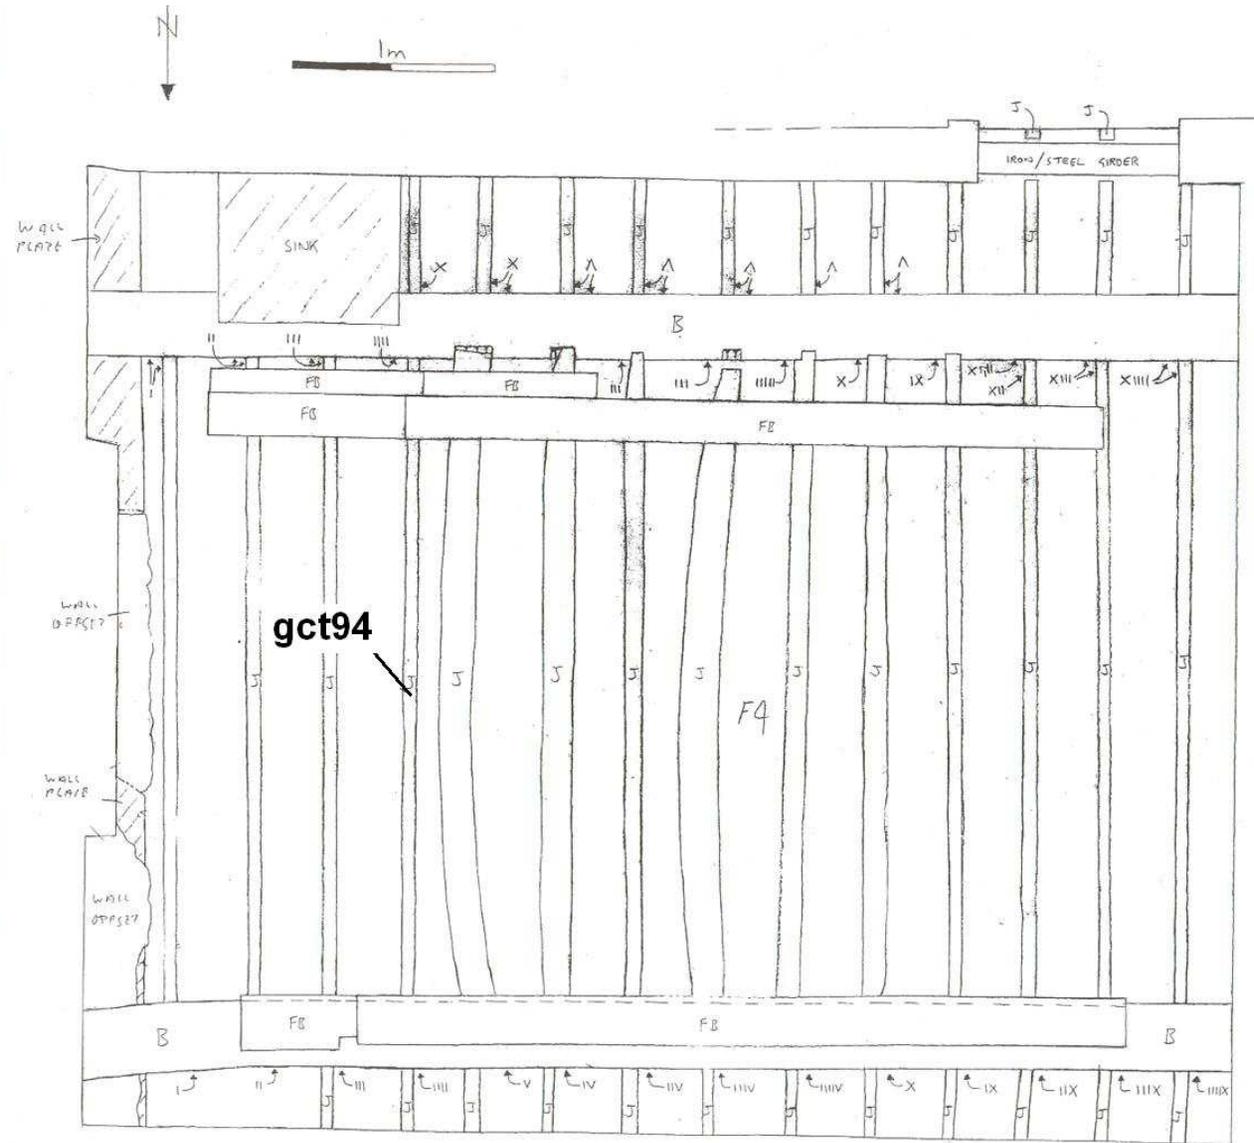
Floor plan of room F4, showing the timber sampled for dendrochronology
